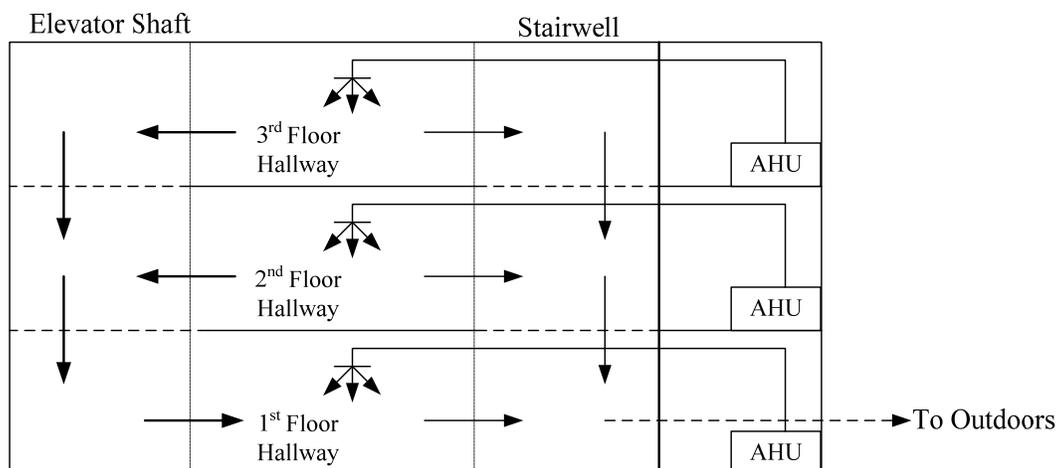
Elevator shaft and stairwell airflow schematic for the floor-by-floor AHU scenario
